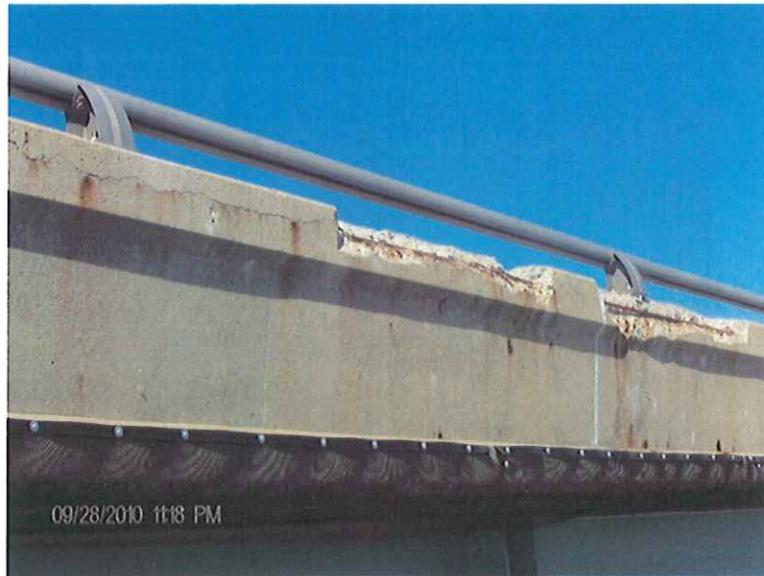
Parapet - spalls with exposed reinforcing steel on the exterior face
